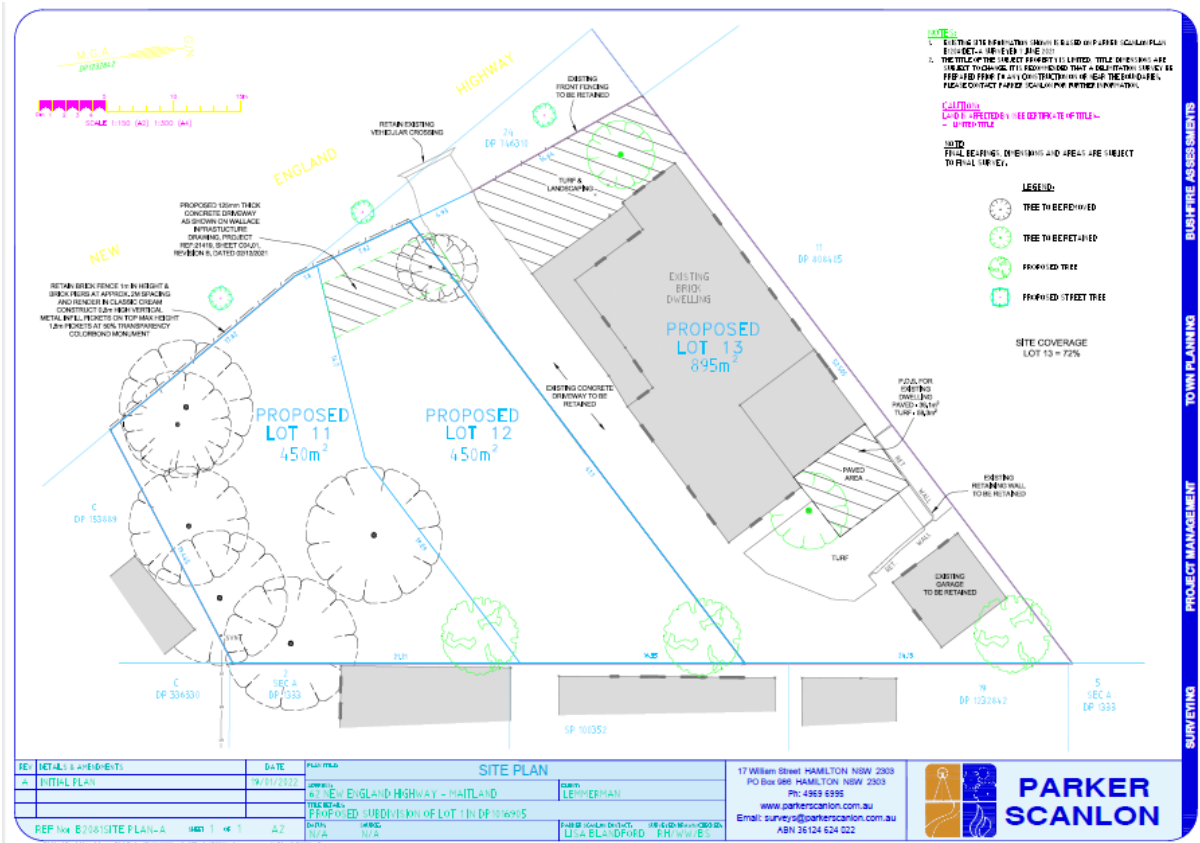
Site Plan of Development (Parker Scanlon, January 2022)
